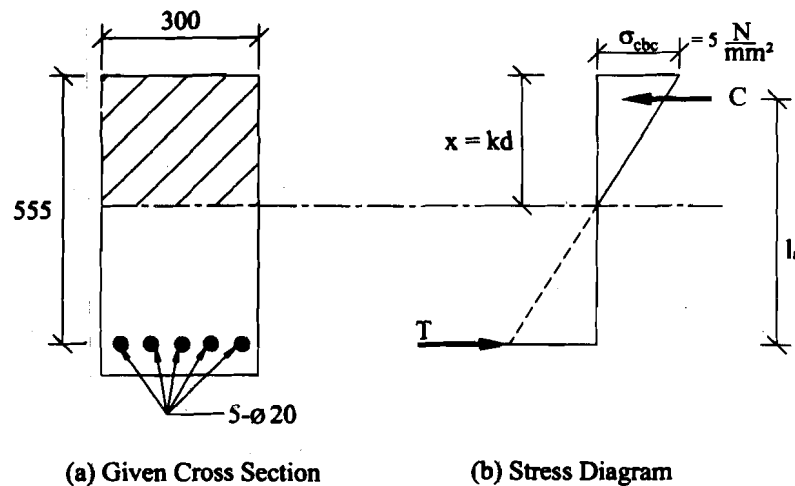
Showing Cross-Section and Stress Diagram of the Beam
